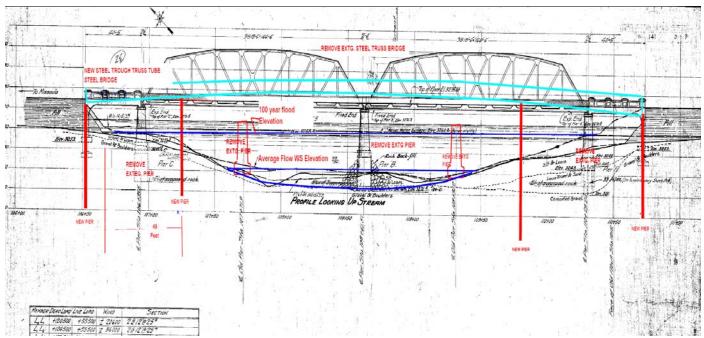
Cross Section Showing Existing Bridge, Existing Pier Locations, and New Pier Locations
